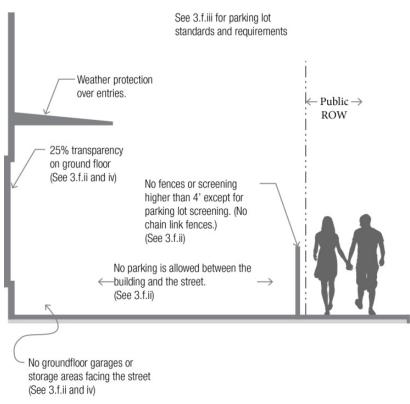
B.3.j. Requirements for residential buildings within 30' of an Entry Street ROW. (This diagram is for illustrative purposed only. See Section 18.120.020.8.b for stated requirements.)
